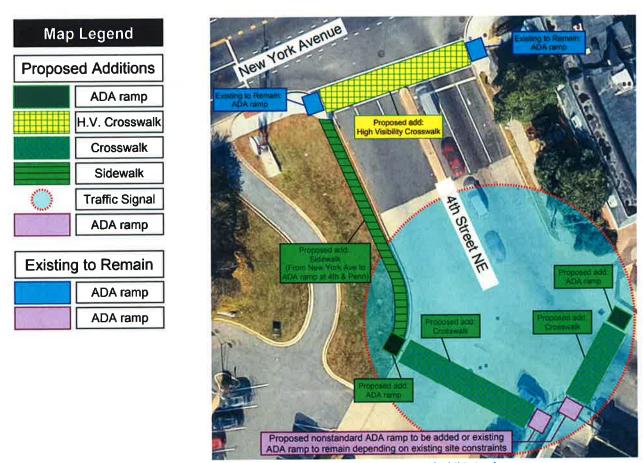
Applicant-proposed Pedestrian Improvements (Exhibit 35D)
